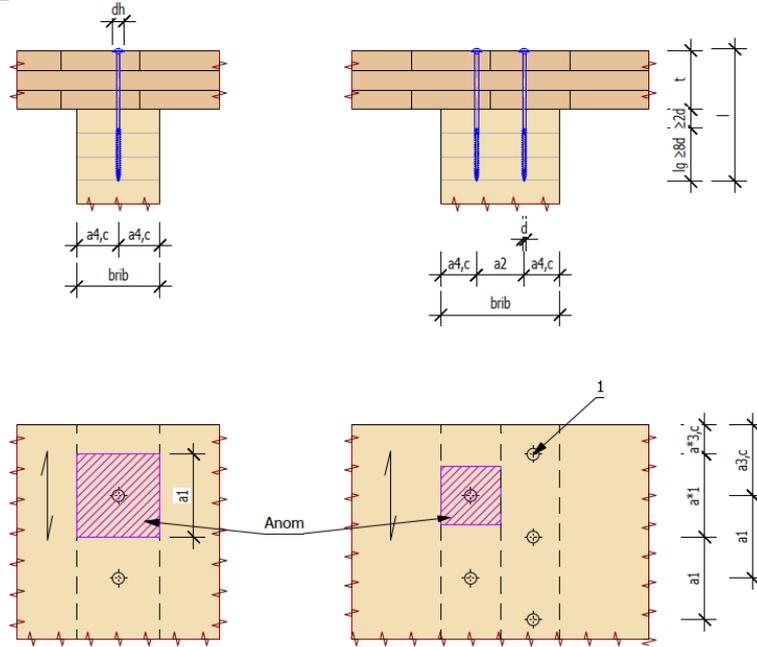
Spacing, end and edge distances of screws for screw press gluing
